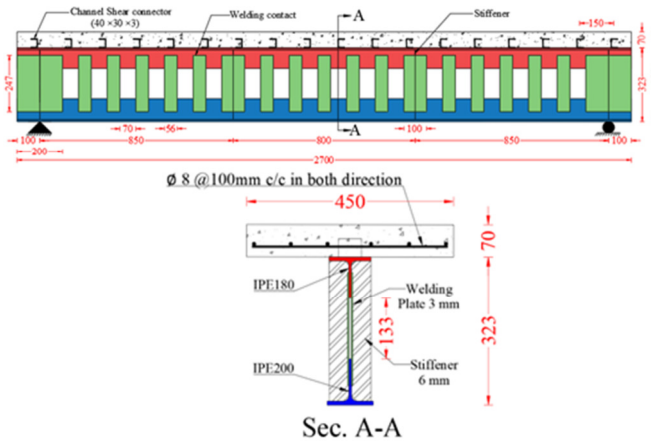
Details of the BS-E70-T3-L70 specimen.
